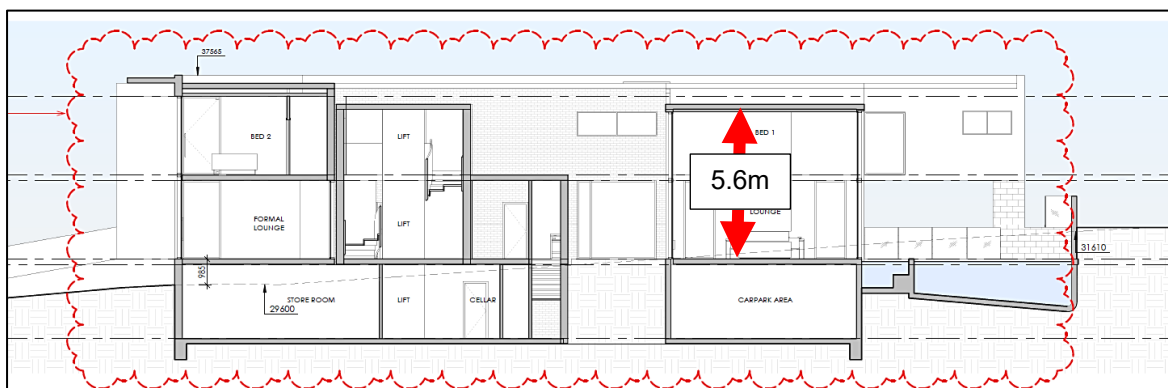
Section showing ground floor, first floor and void space ceiling heights
